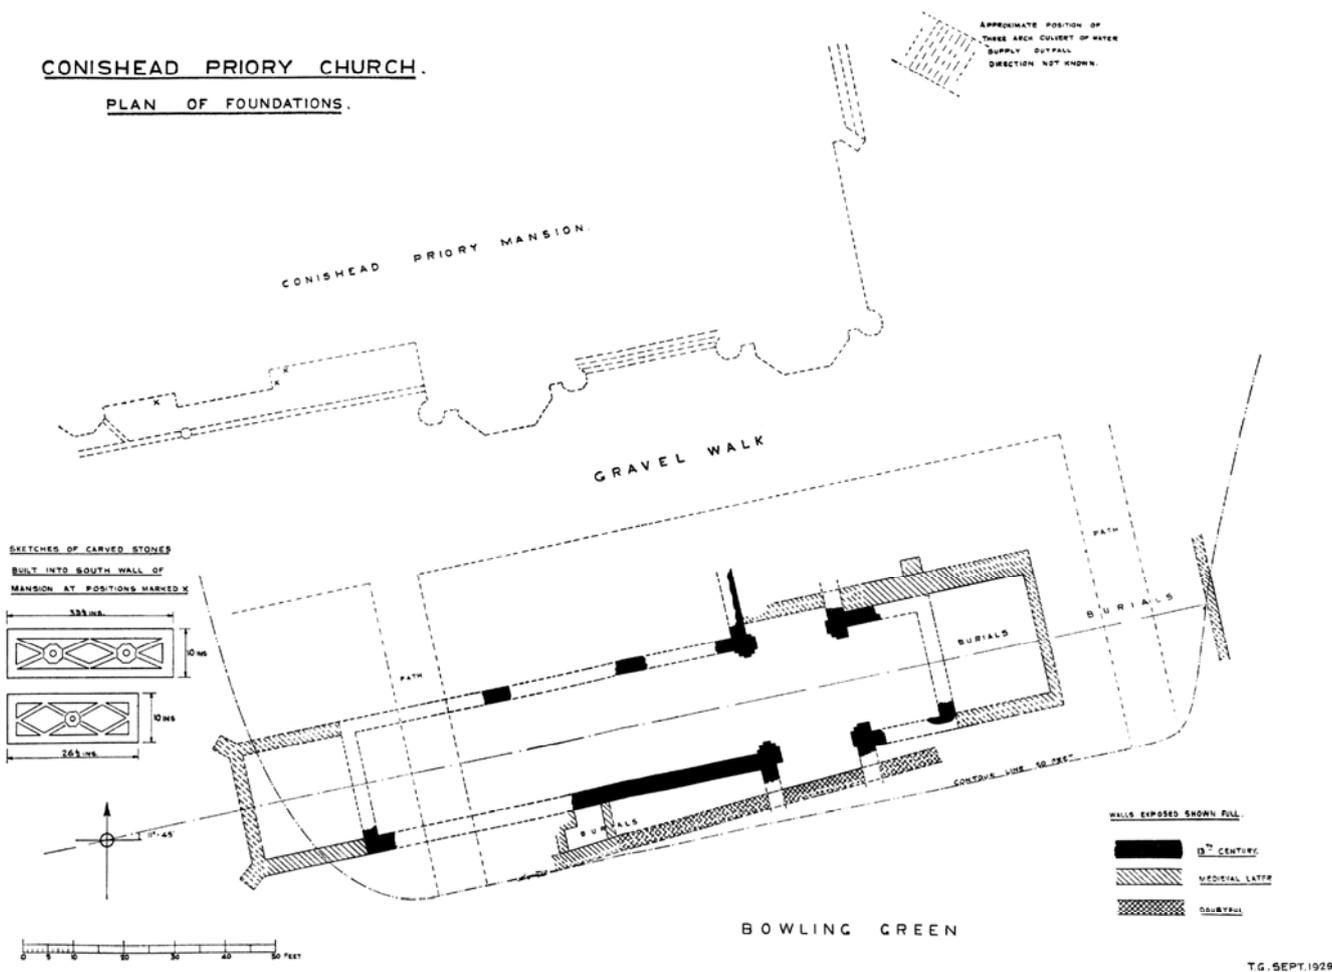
Plan of church foundations (after Kelly 1930, 149)
